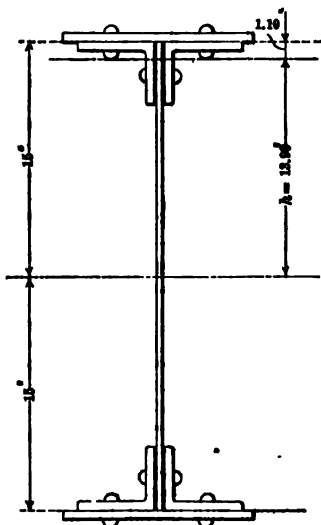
Moment of Inertia of Cross-section of Plate Girder with Flange-plates
